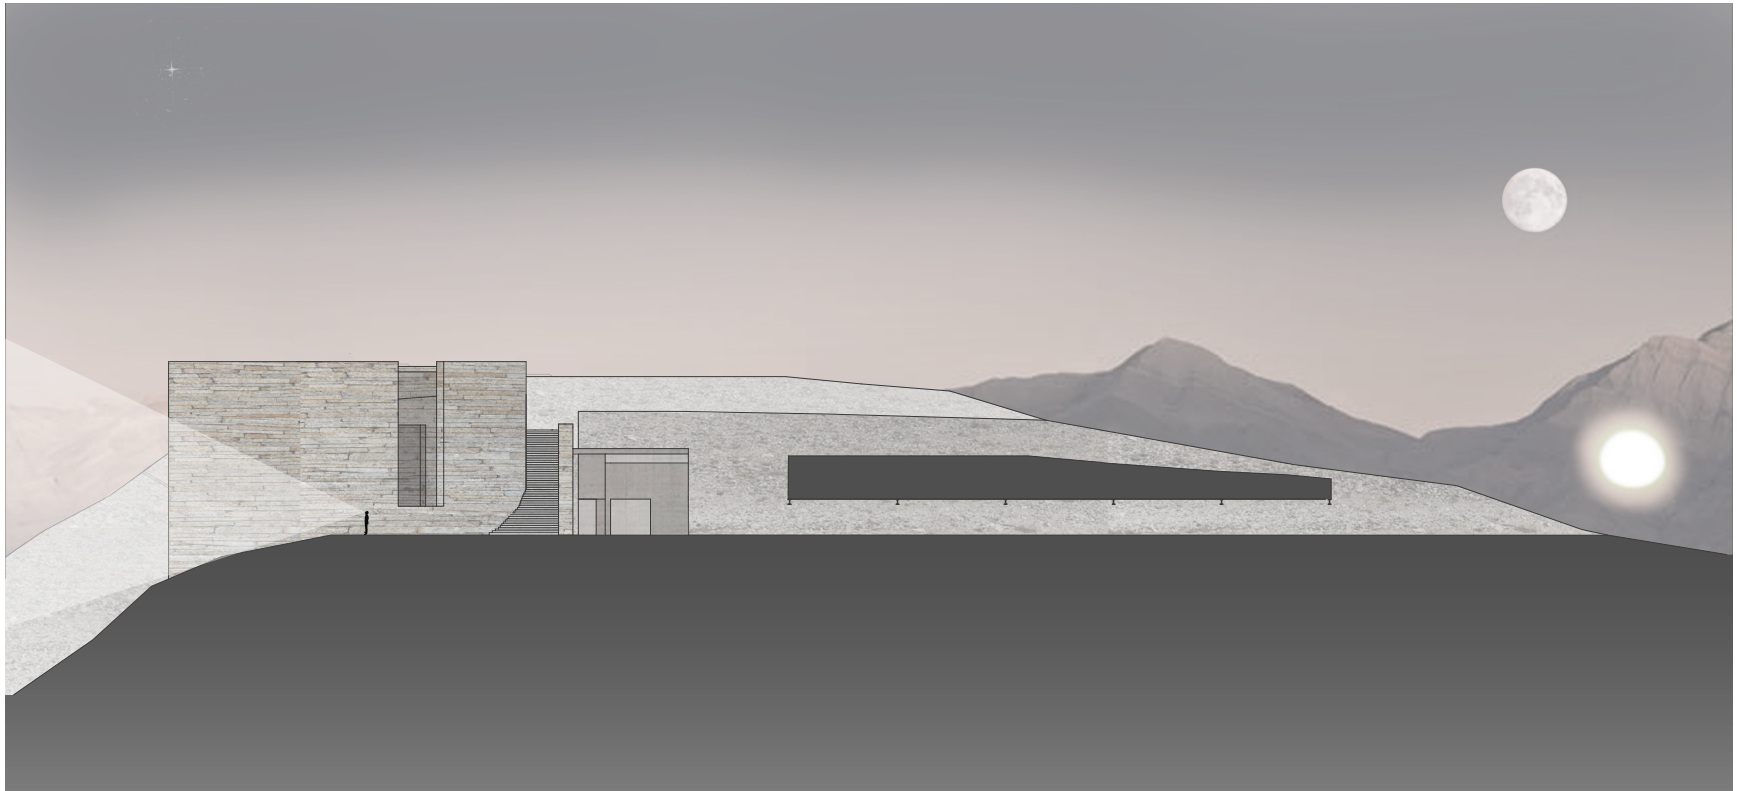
| Section facing east showing path carving through the landscape to access primary views to the north
